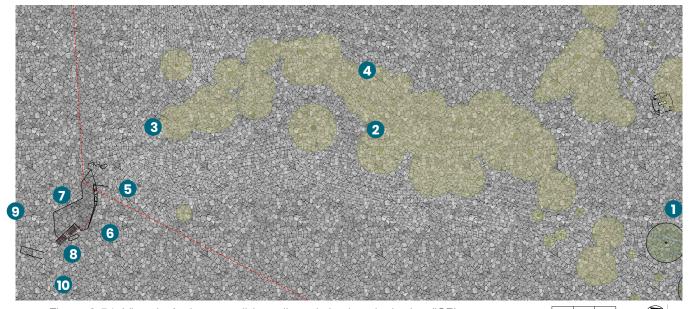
Victoria Arch accessible walk and viewing deck plan (ISP)
